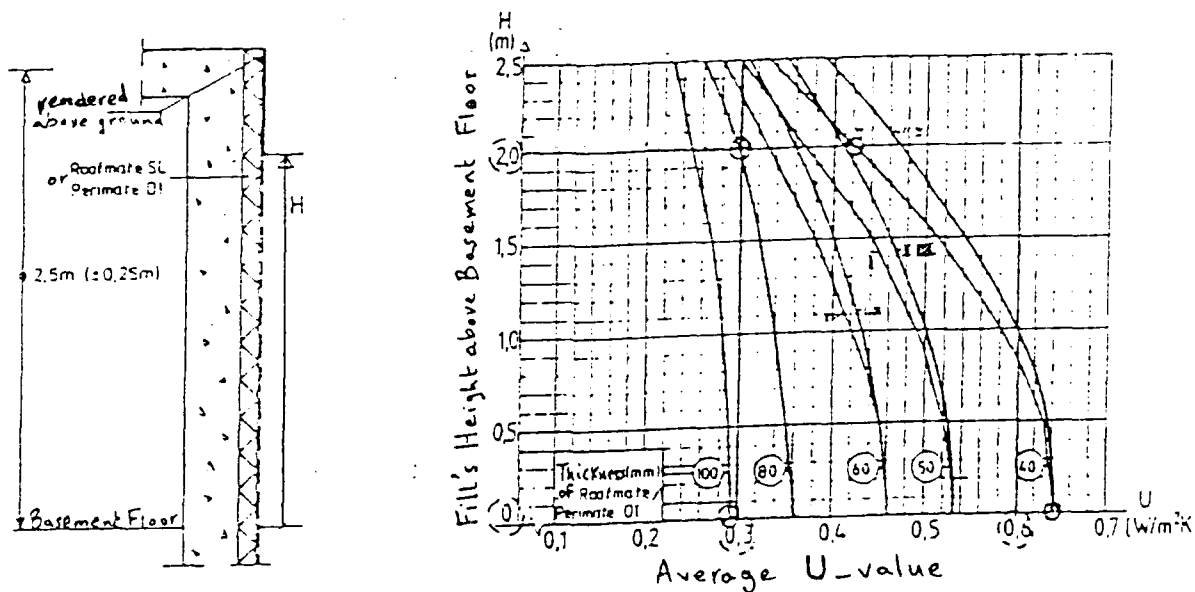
2.5 m high concrete basement wall with the same thickness of Roofmate SL/Perimate DI styrofoam above and below ground.
